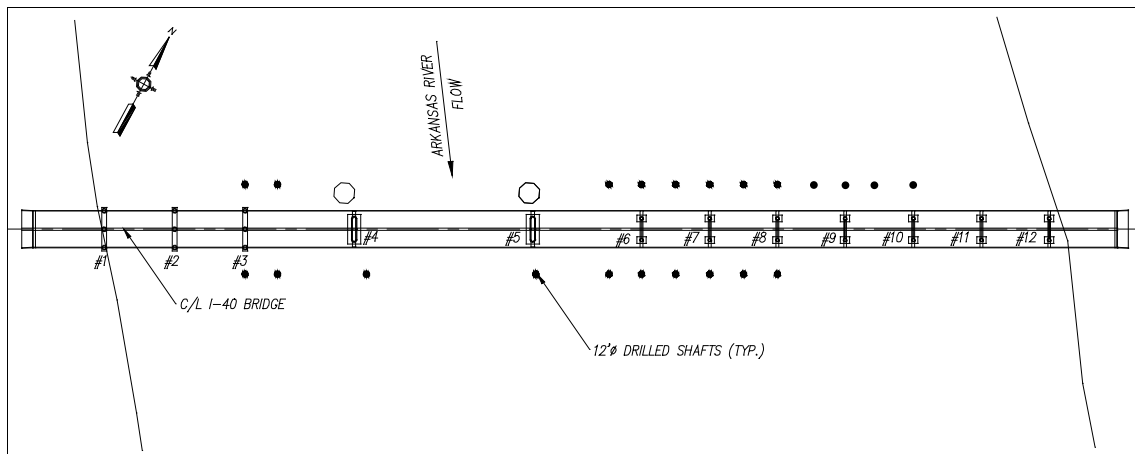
Bridge Plan View Showing Additional 12-Foot Diameter Drilled Shafts Protection
